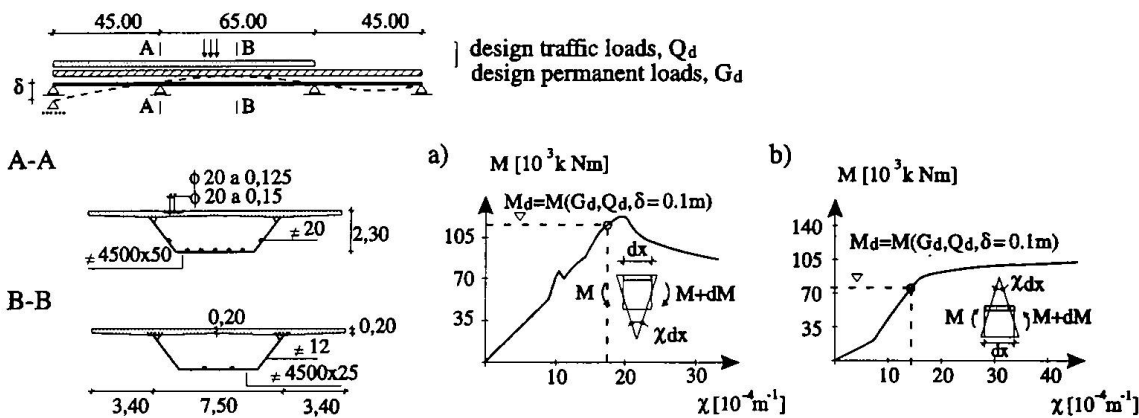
Composite box girder bridge with typical cross-sections and their behaviour in terms of moment vs. curvature, a) at the support (section A-A), b) in the span (section B-B).
